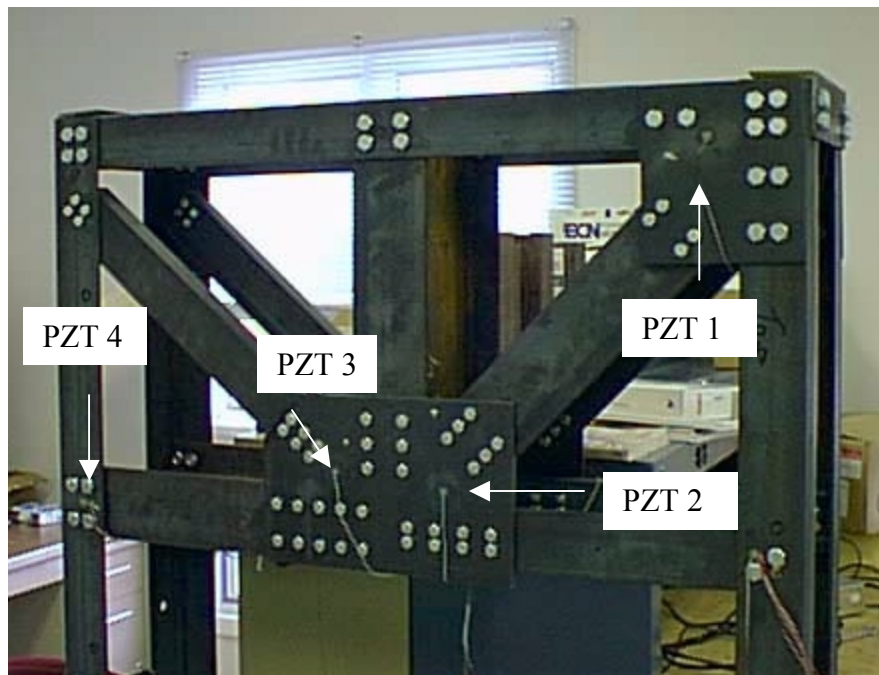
A $\frac{1}{4}$ scale steel bridge section
